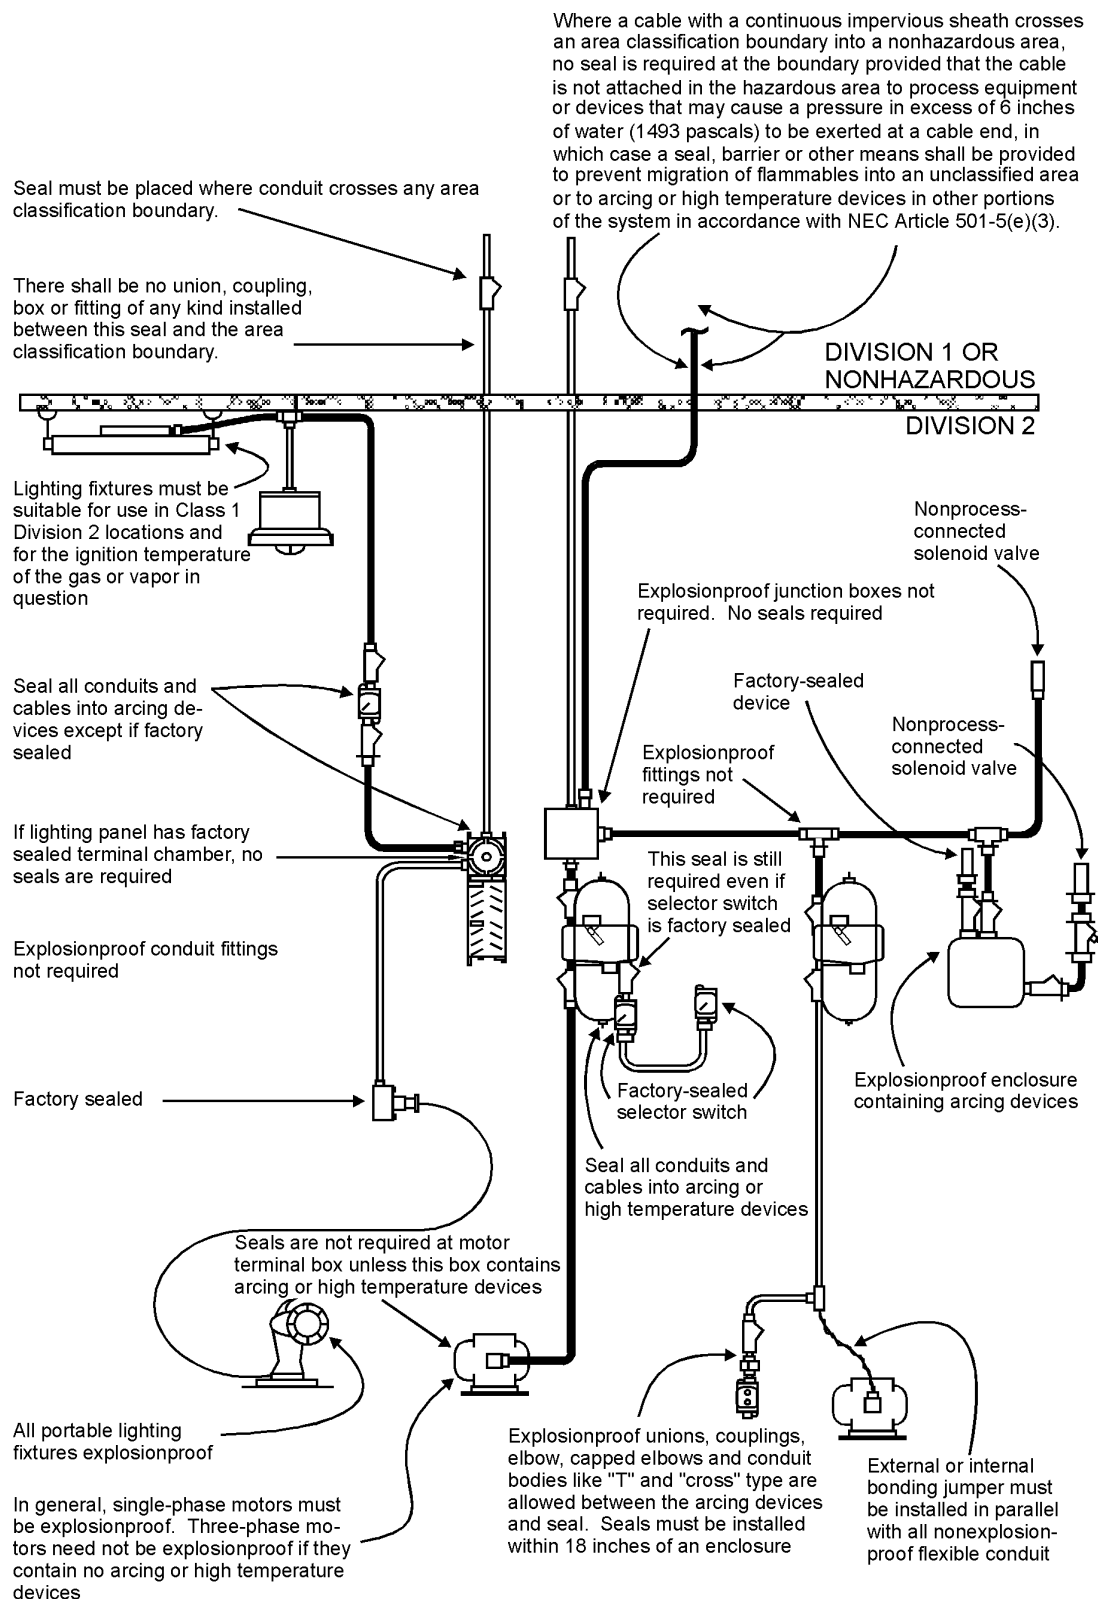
Typical United States and Canadian Class I, Division 2 conduit/cable system installation
